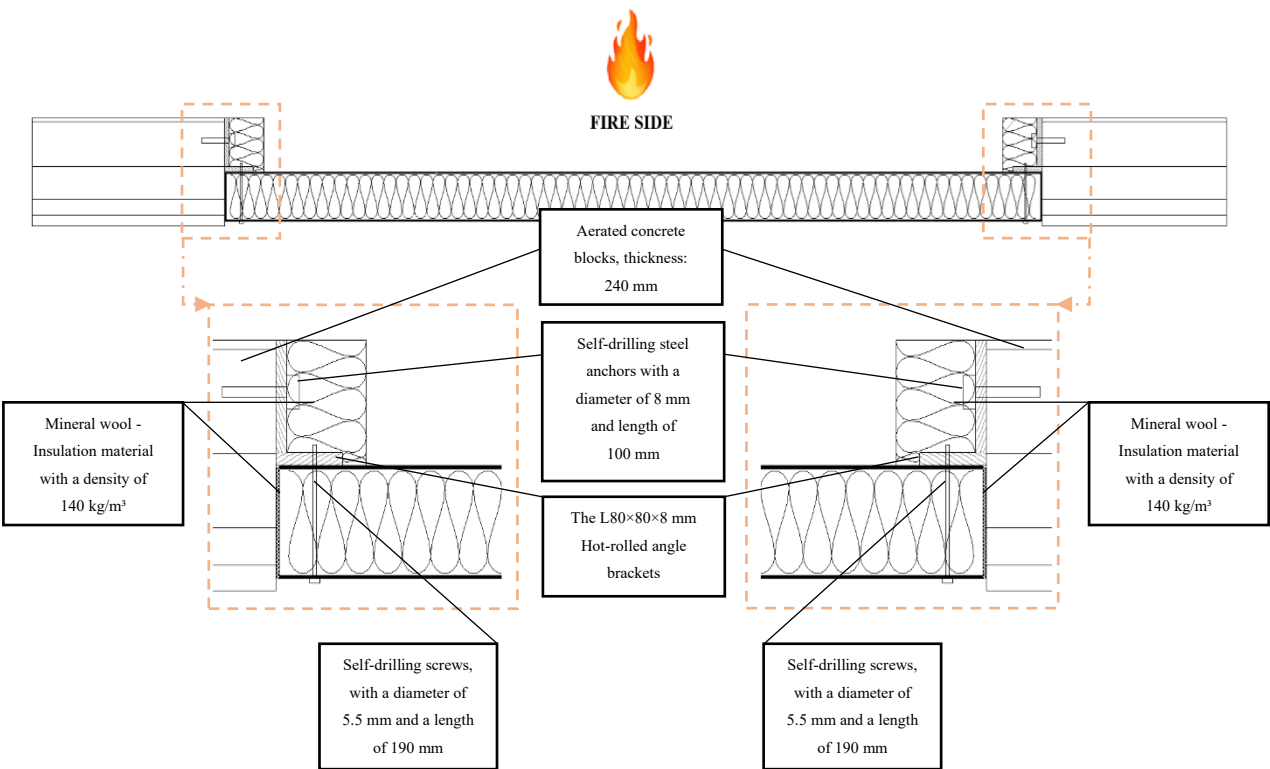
Horizontal cross section of samples evaluated assembled on mounting structure.
